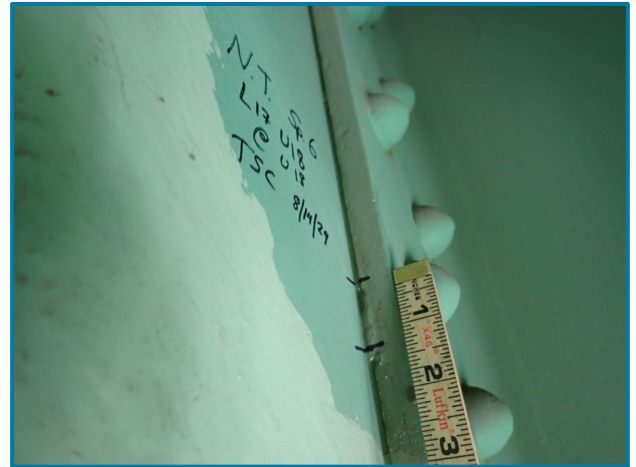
1-1/2" long cracked tack weld (L17U18 of the North Truss, Span 6).
